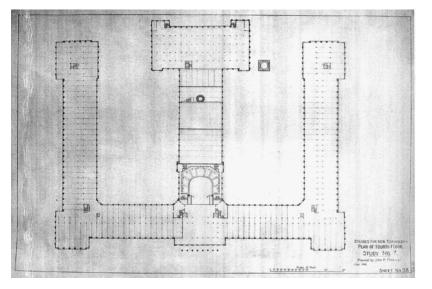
4th floor plan of the academic building. The central series of the structural columns define the double loaded corridor.
